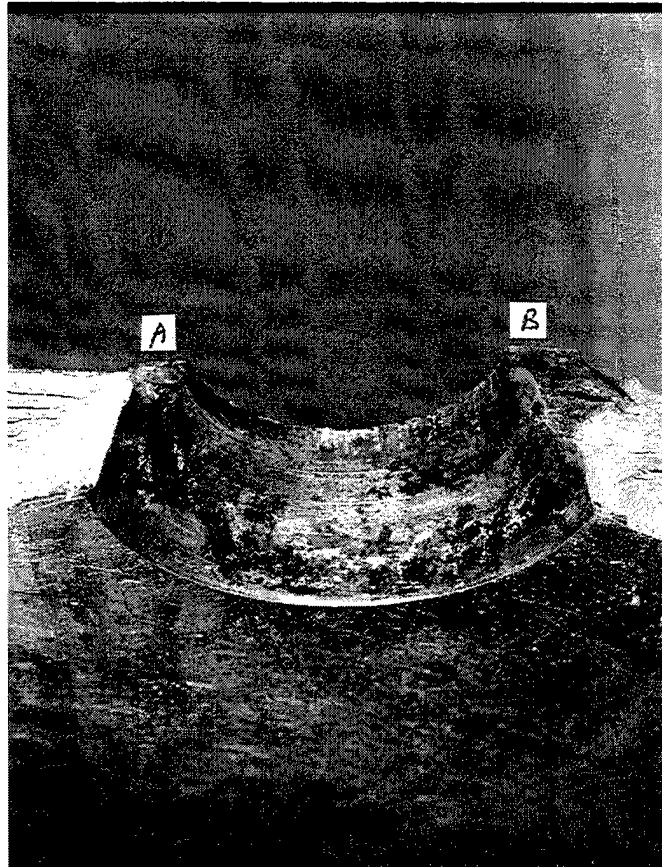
Enlarged view of the fractured countersunk rivet hole in Figure 21, viewing the hole from the bottom surface of the angle. The discolored areas at locations A and B and fatigue beach marks at both corners of the hole were the origin sites of the brittle failure in the bottom chord angle. Magnification: 2.2x.
